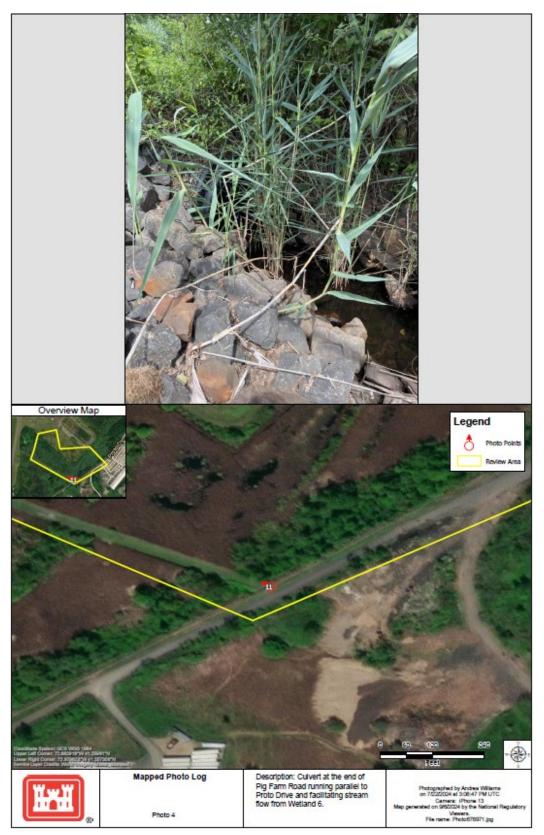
Mapped Photo Log (Culvert 2- Proto Drive)
